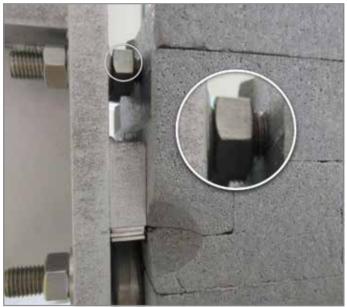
Inner nut on the upper bolts for the adjustment of a camber
